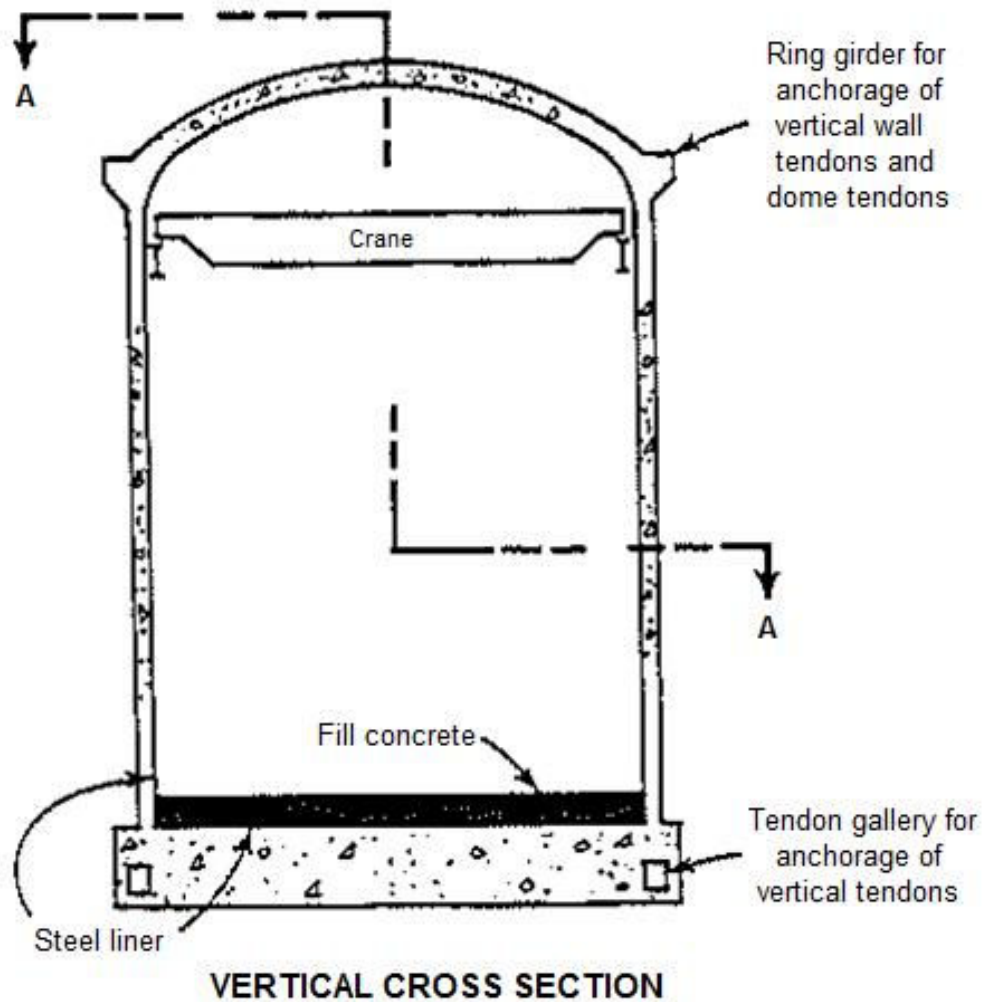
Steel-lined post-tensioned concrete containment for Pressurized Water Reactor: Vertical Cross Section
